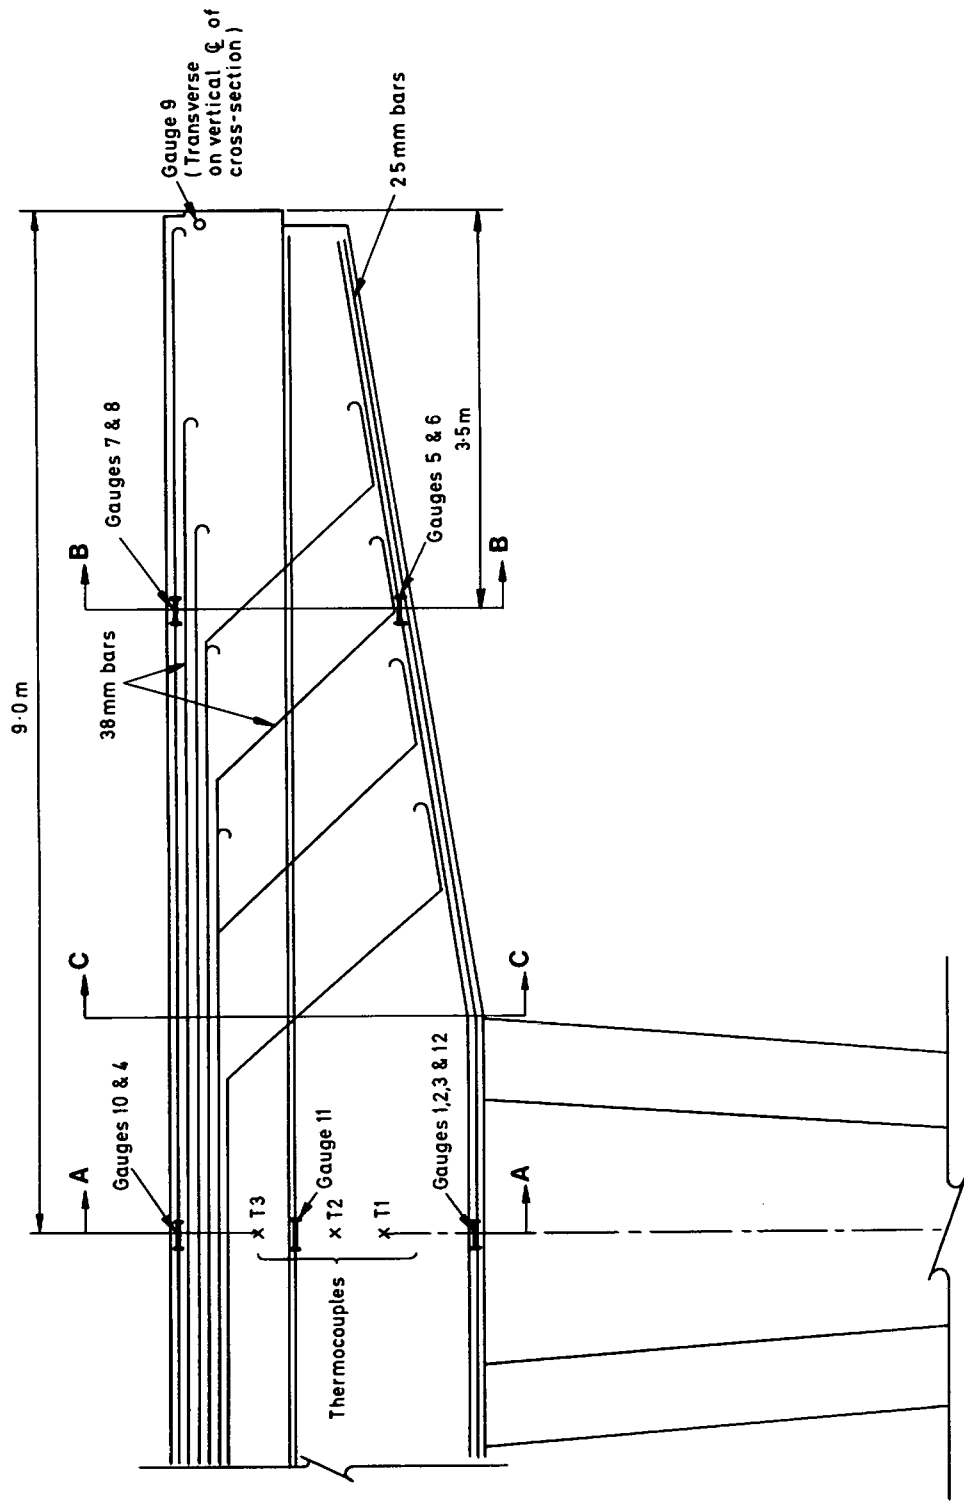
ELEVATION OF CANTILEVER SHOWING INSTRUMENTATION
